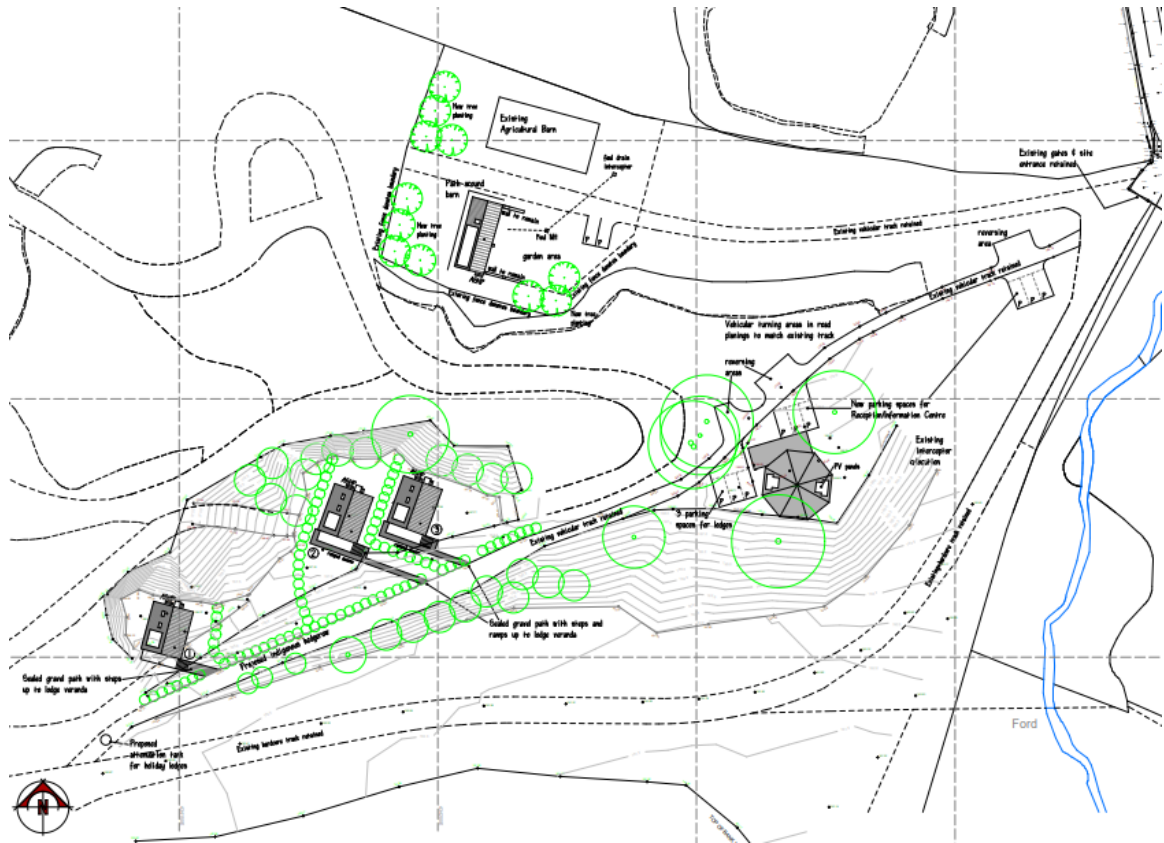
The application detailing showing the building to be converted, the holiday lodges and café/reception building.
